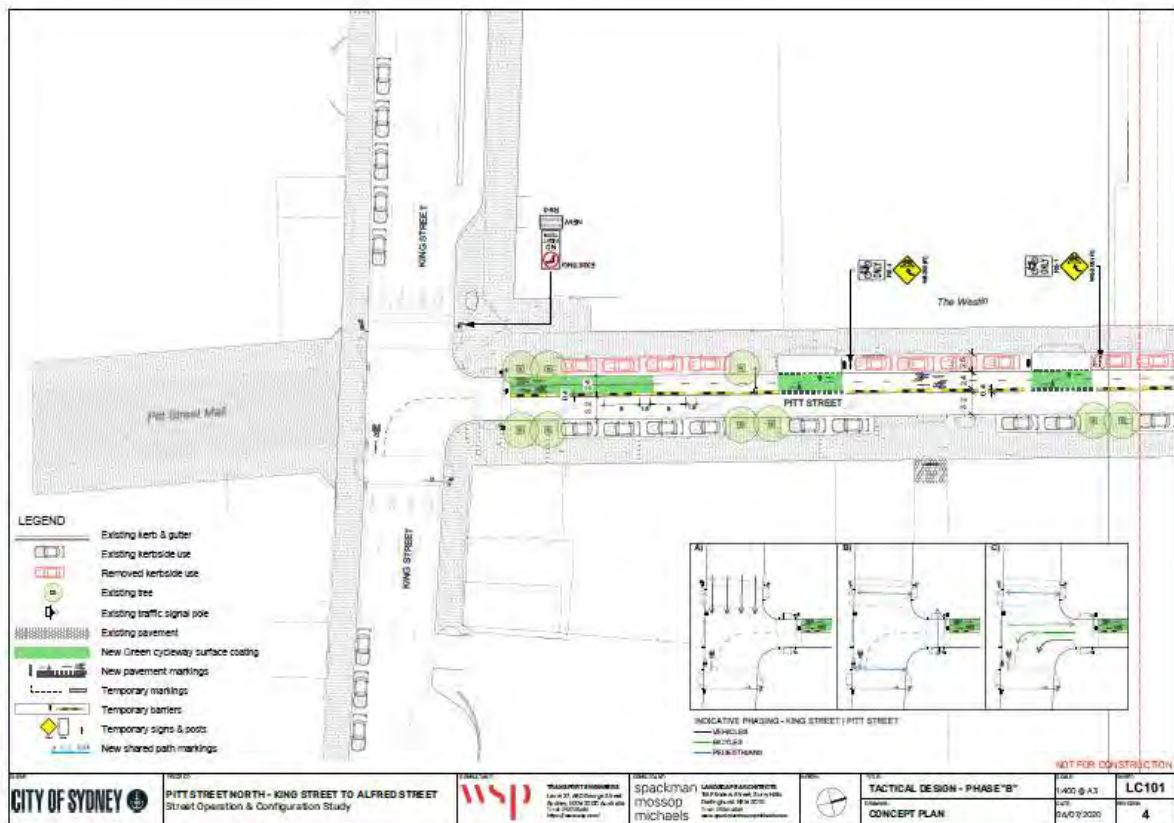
Tactical Design Plan – Phase B – Concept Plan [Drawing LC101 Rev4] (Source: City of Sydney, WSP, spackman mossop michaels, 2020)
